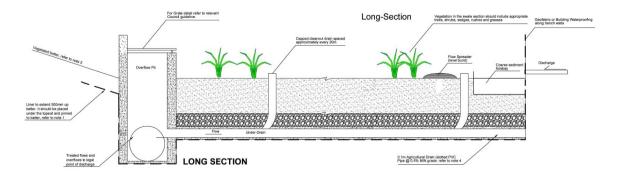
Typical Bio-Retention Long Section (Gilbert and Sutherland)
